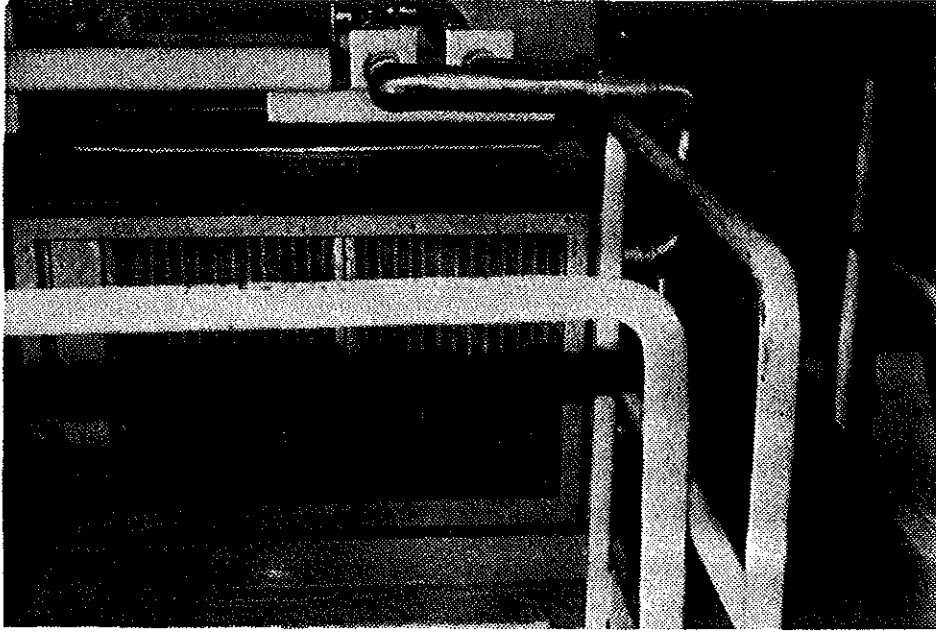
, AIR HANDLING UNIT (REF. ALLEGATION NO. 18)
